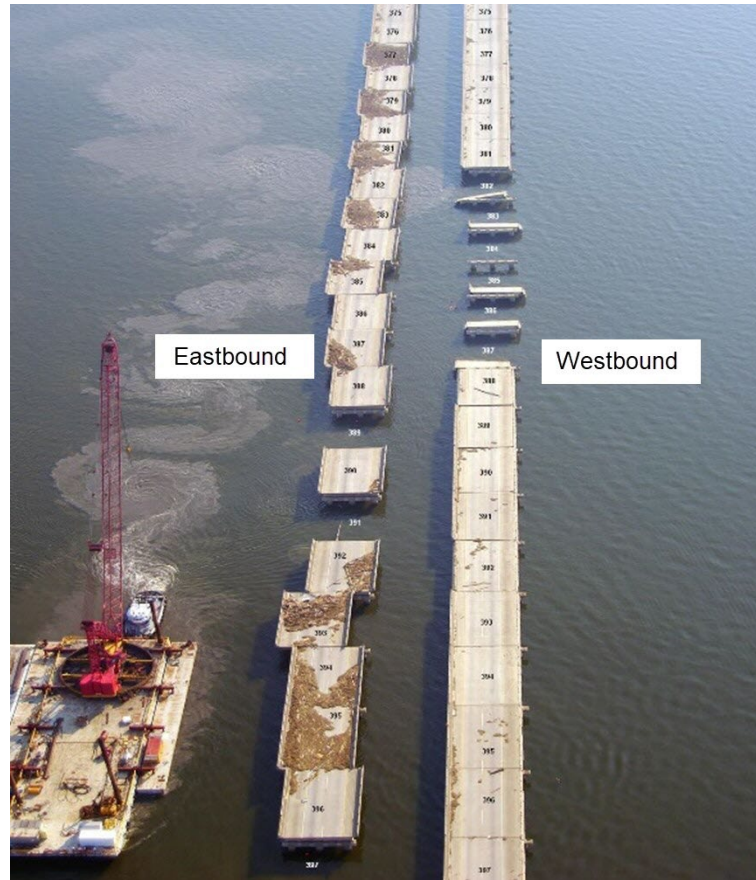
Failure Due to High Water Levels During Hurricane: Aerial View
